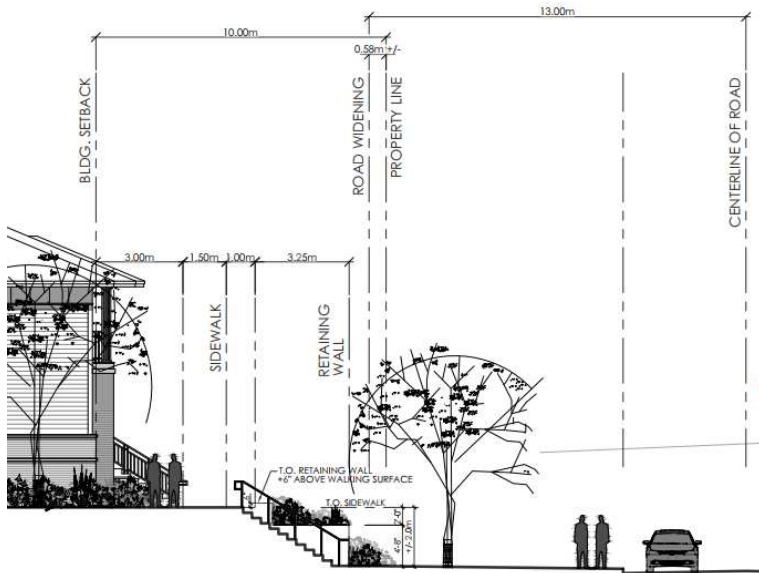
Section of stacked back-to-back "terra flat" dwelling facing Woodroffe Avenue, provided by M. David Blakely Architect Inc.
